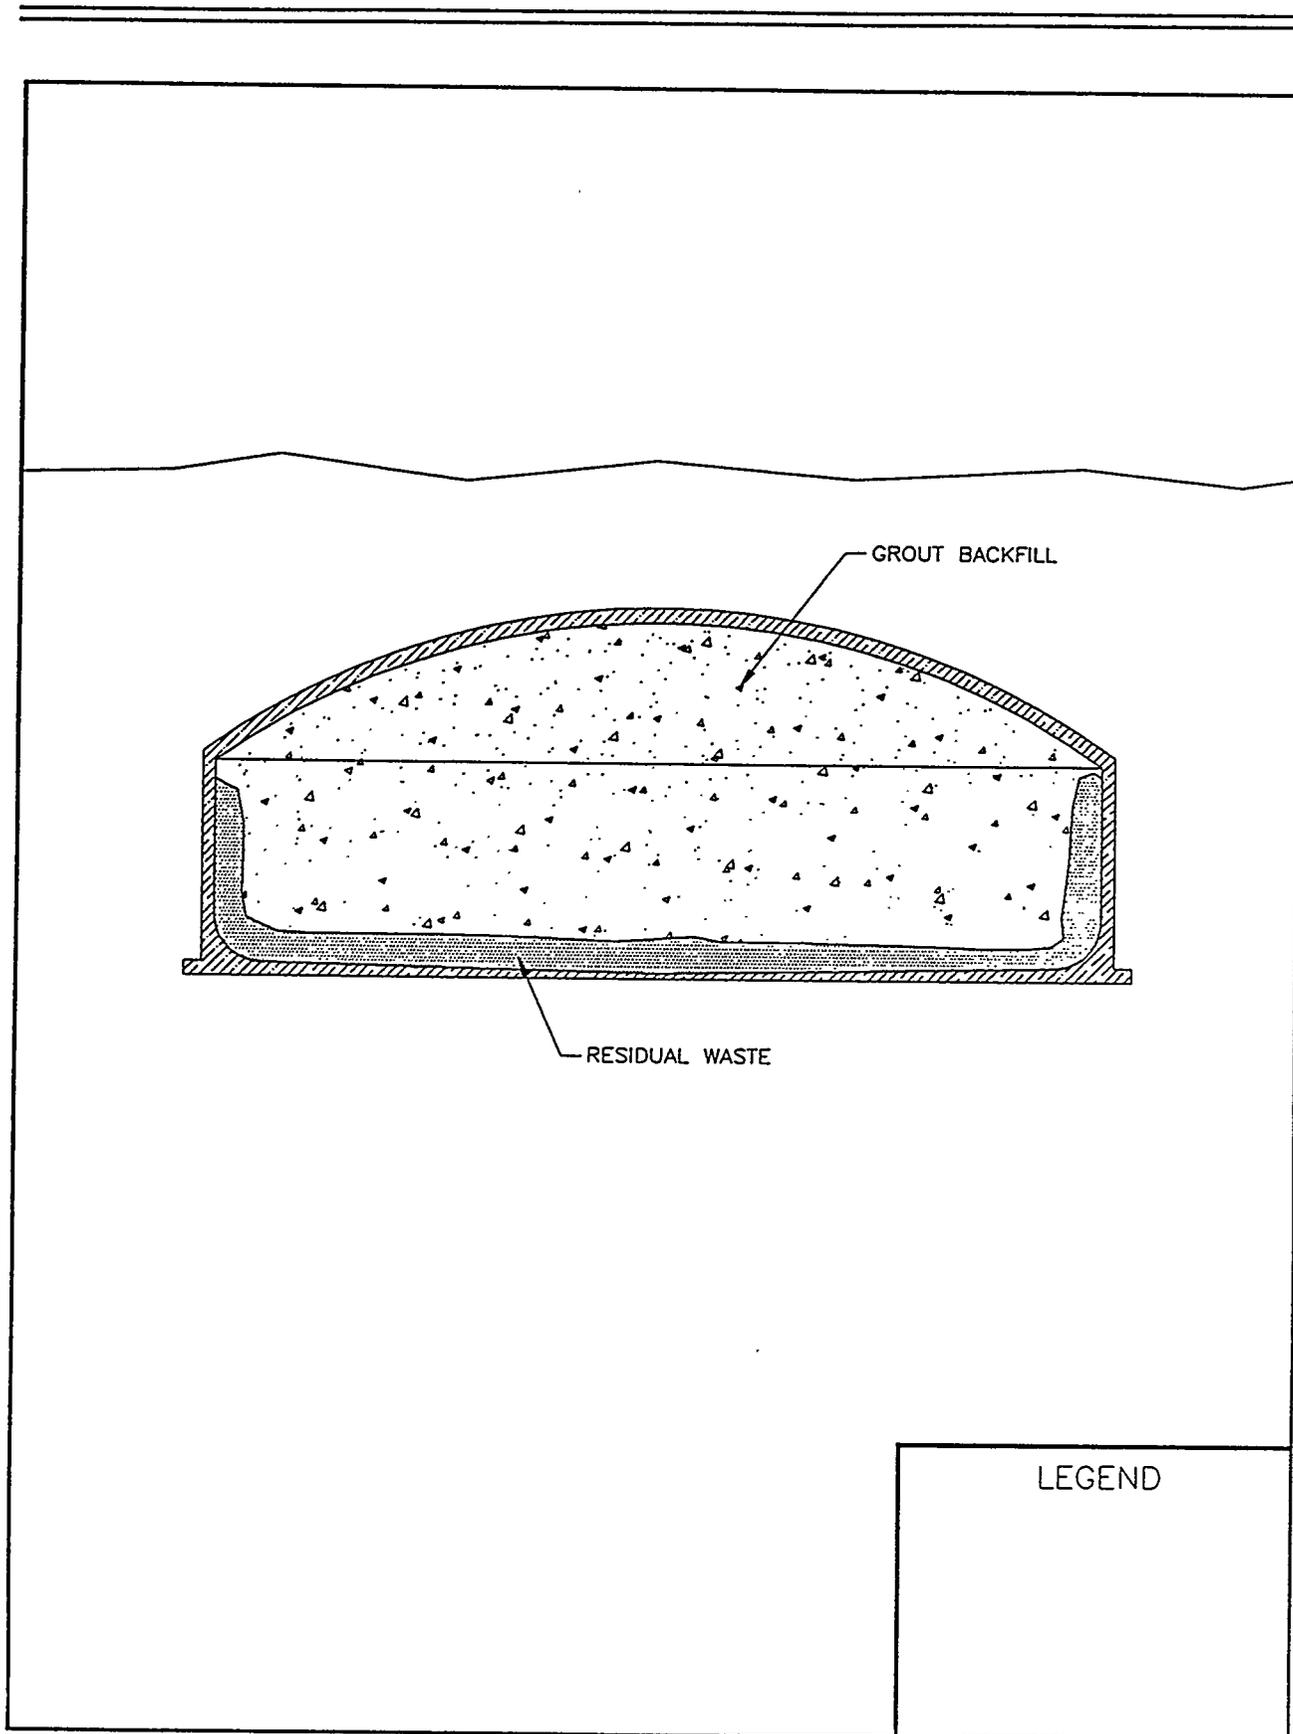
Tank Stabilized with Grout Following Waste Retrieval.
